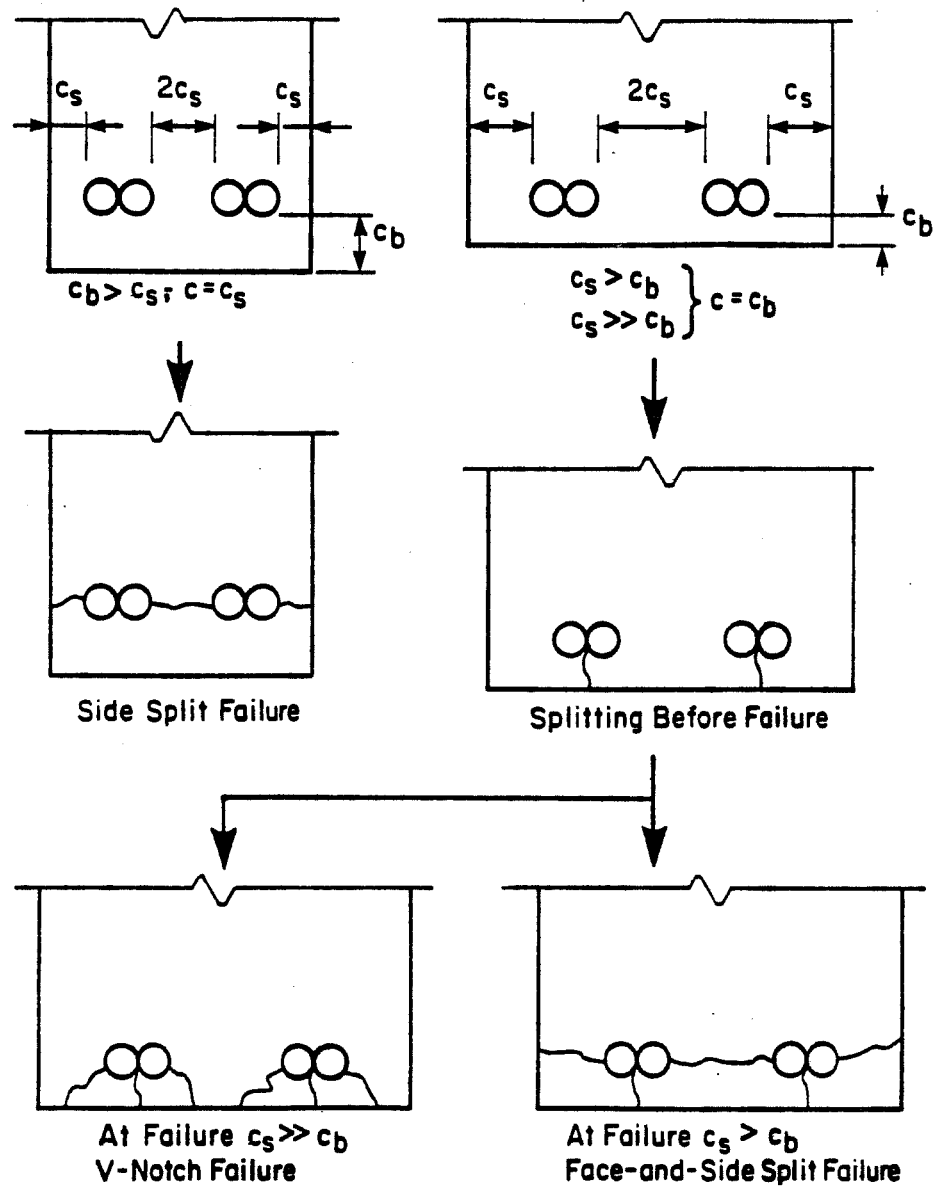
Splitting bond failures, Orangun et al.^[20]
